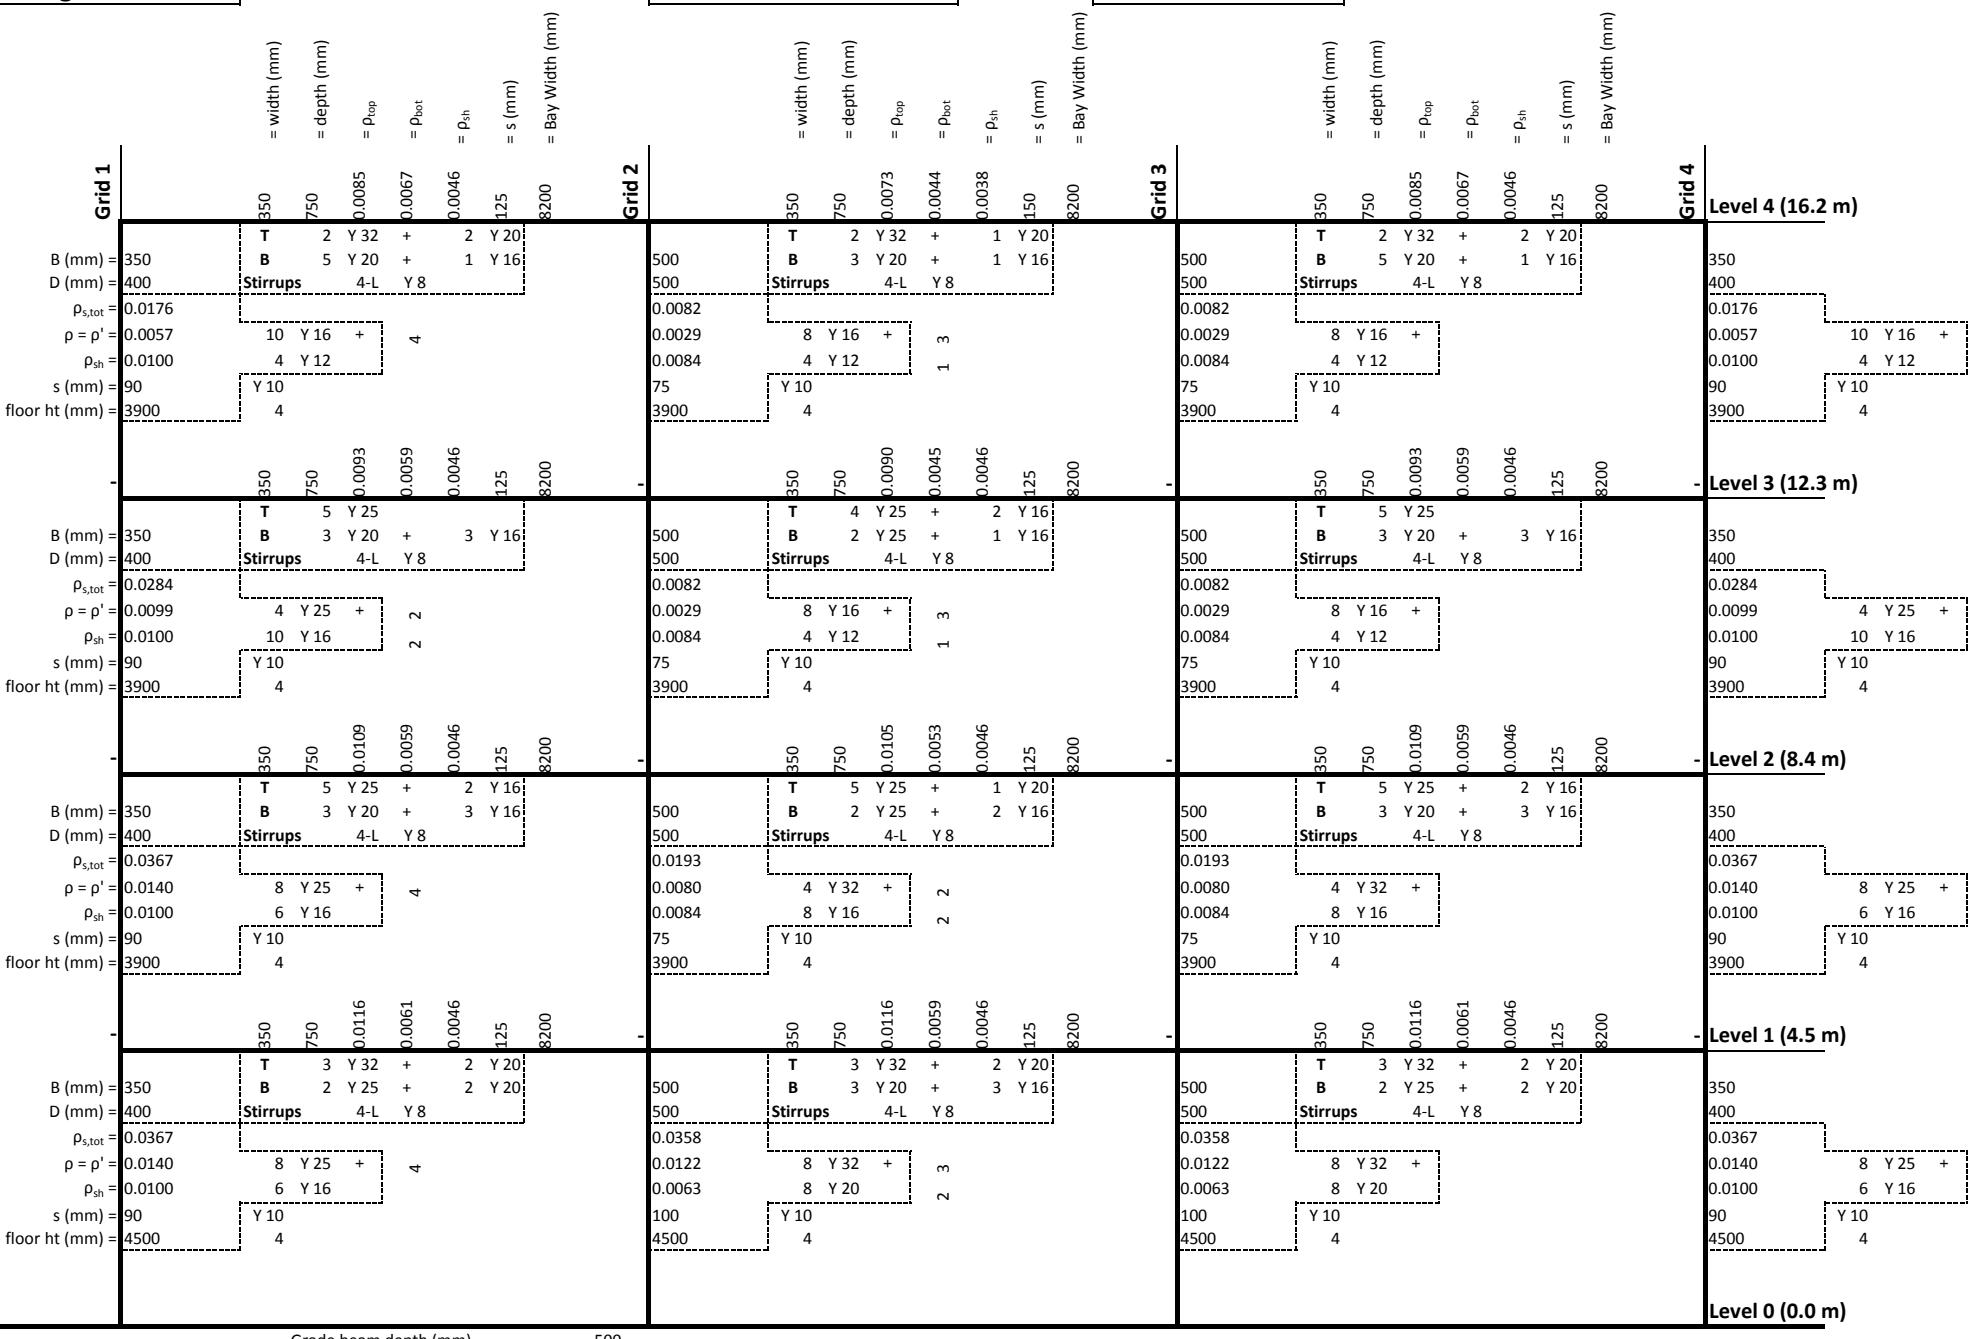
Required longitudinal reinforcement for building ID 2213
